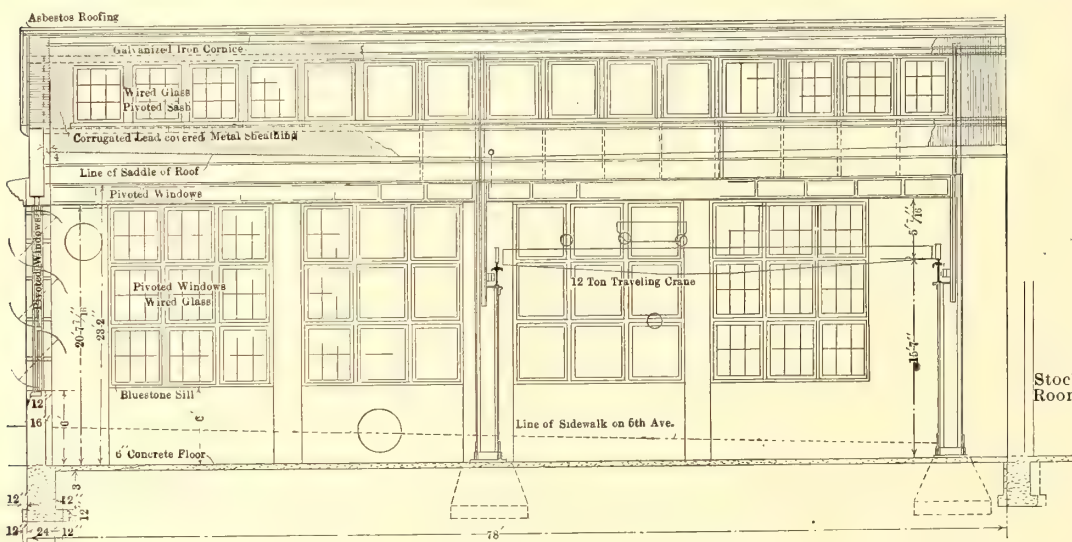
TRANSVERSE SECTION OF MACHINE SHOP, SHOWING THE LIGHTING ARRANGEMENTS
